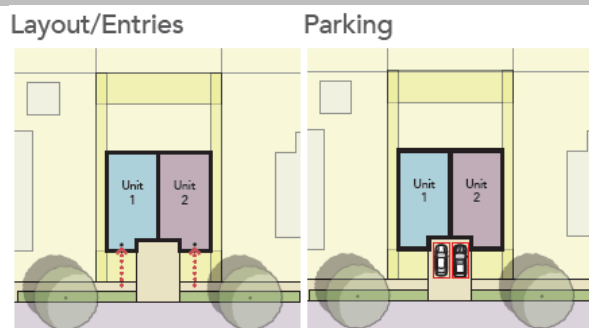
Townhouses in RL Zone (with Reduced Setbacks)
